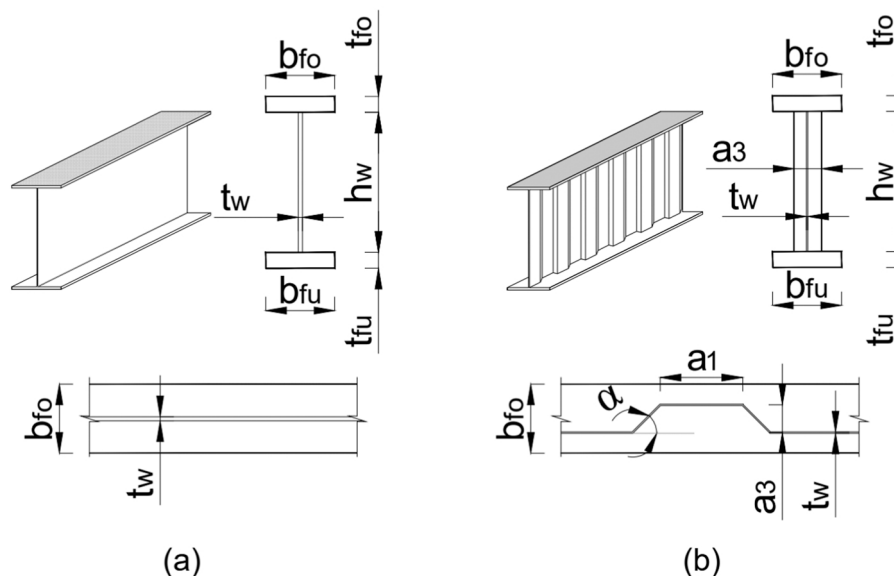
A bridge girder with (a) flat web (b) corrugated web.
